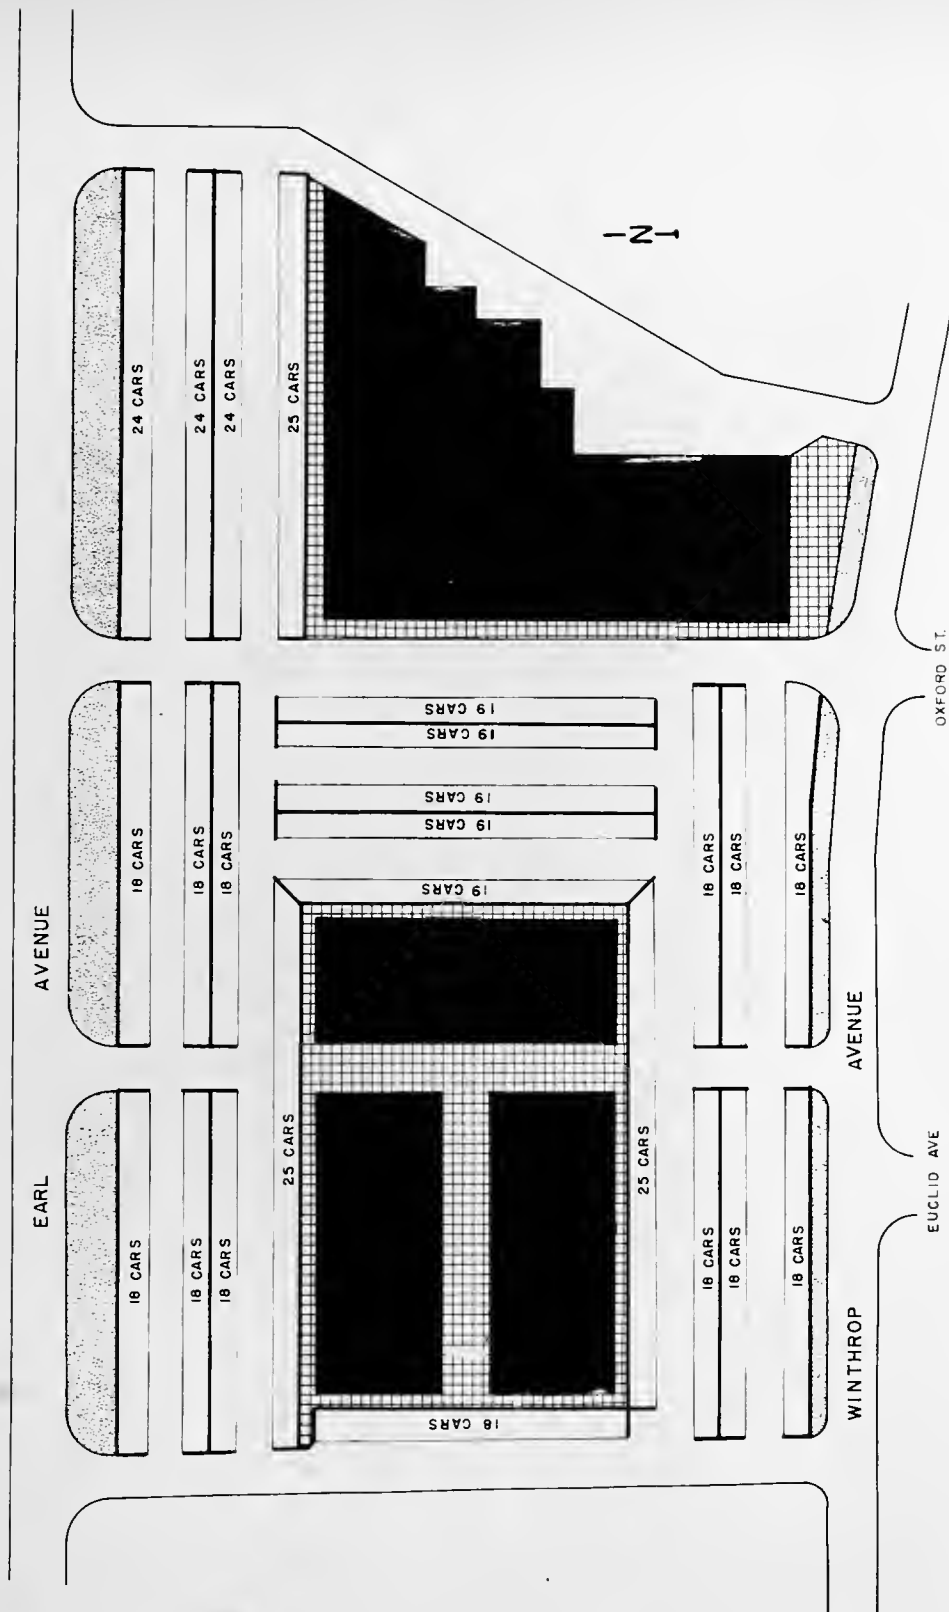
SITE PLAN FOR THE JEFFERSON SQUARE SHOPPING CENTER
